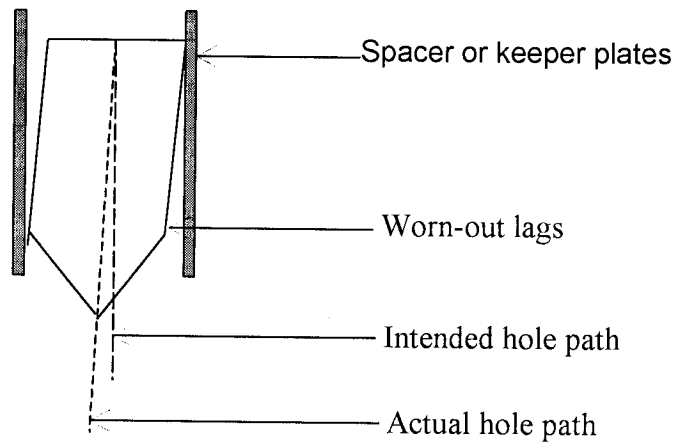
Illustrating worn out parts causing one side to take up more thrust than the other side.
